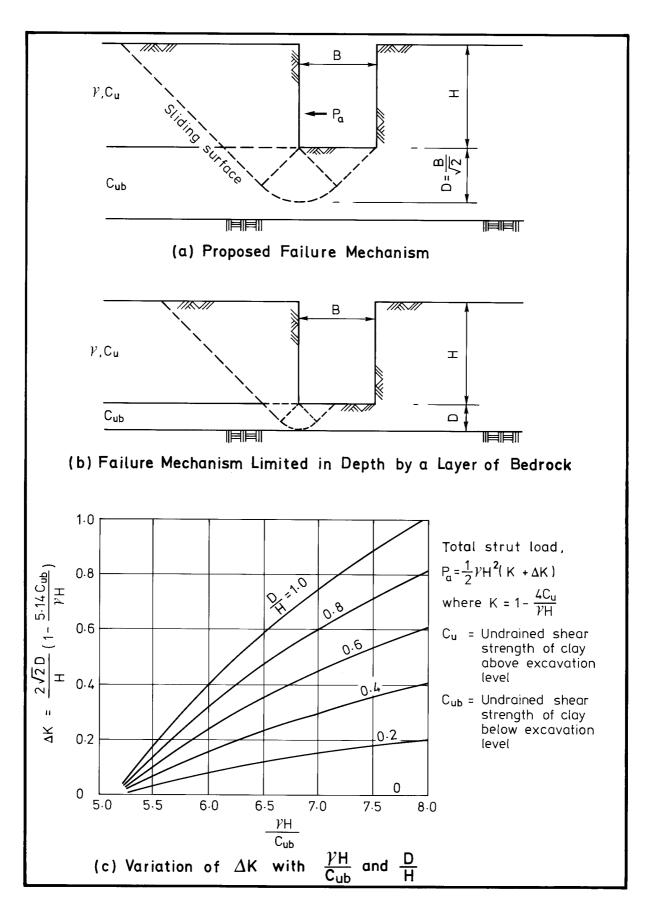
Calculation of Strut Loads in Excavation in Soft Clay (Henkel, 1971)
